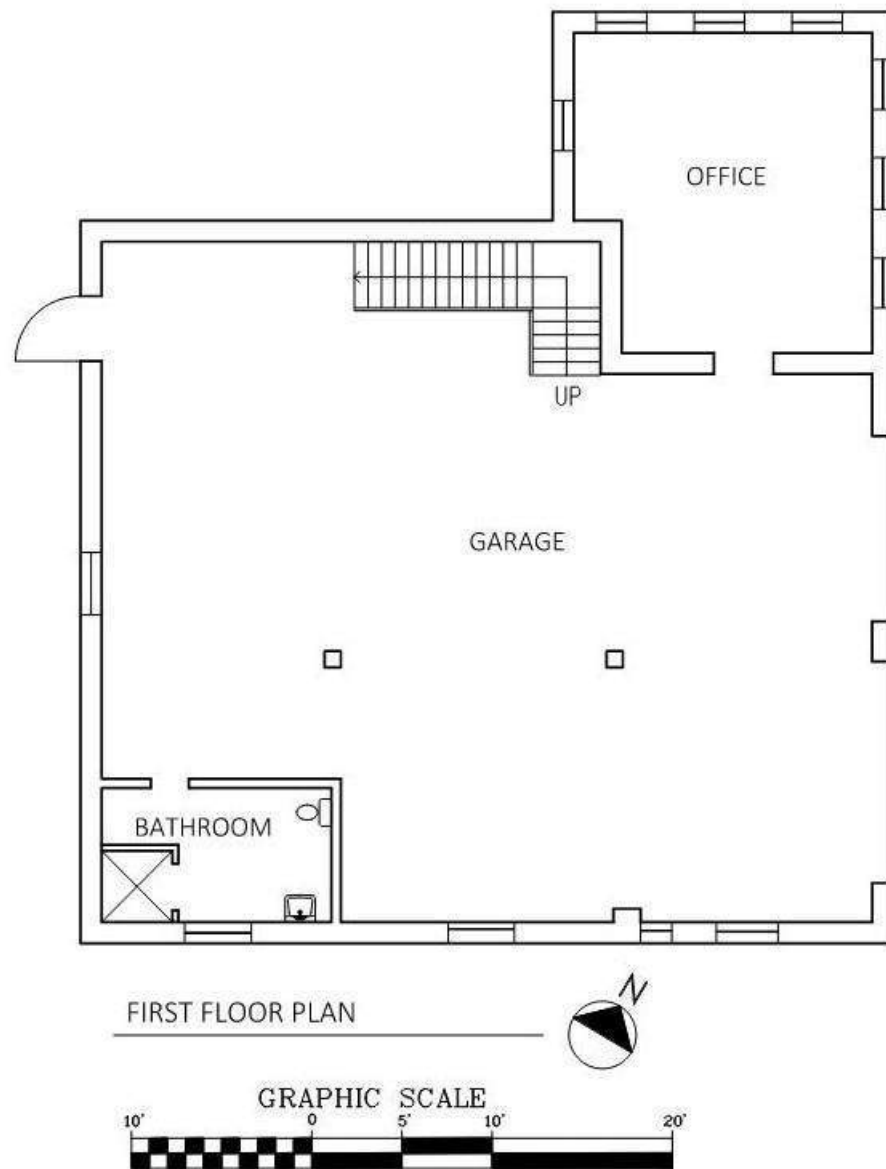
Sketch Plan of First Floor of Maintenance Garage.
